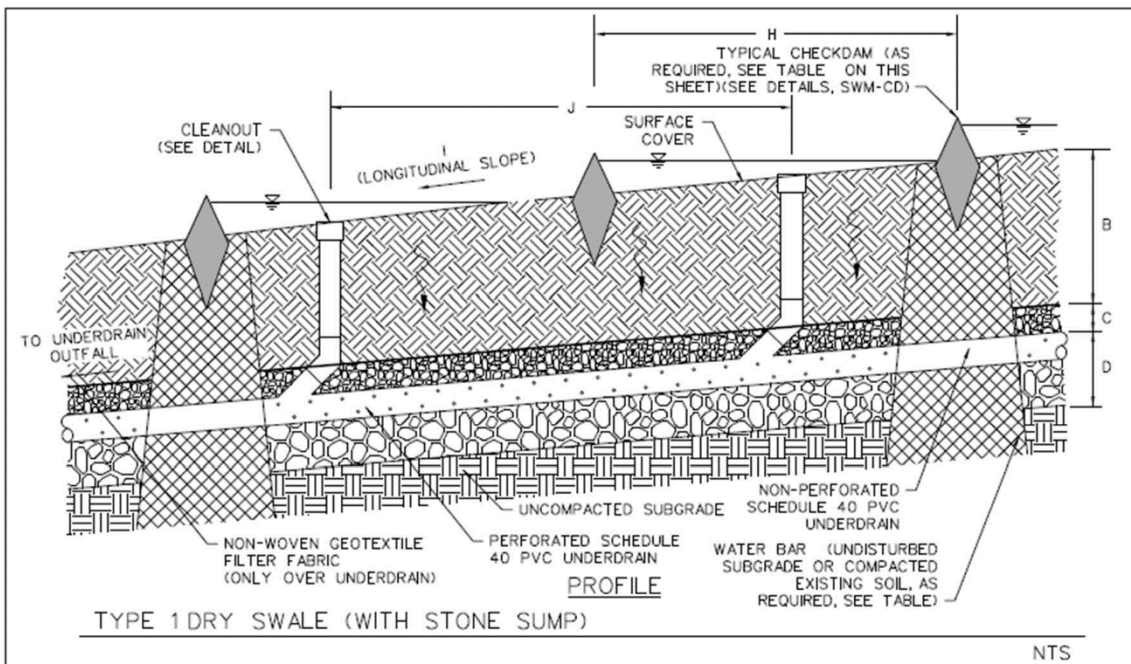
Typical Dry Swale – Level 2 [Profile View]
